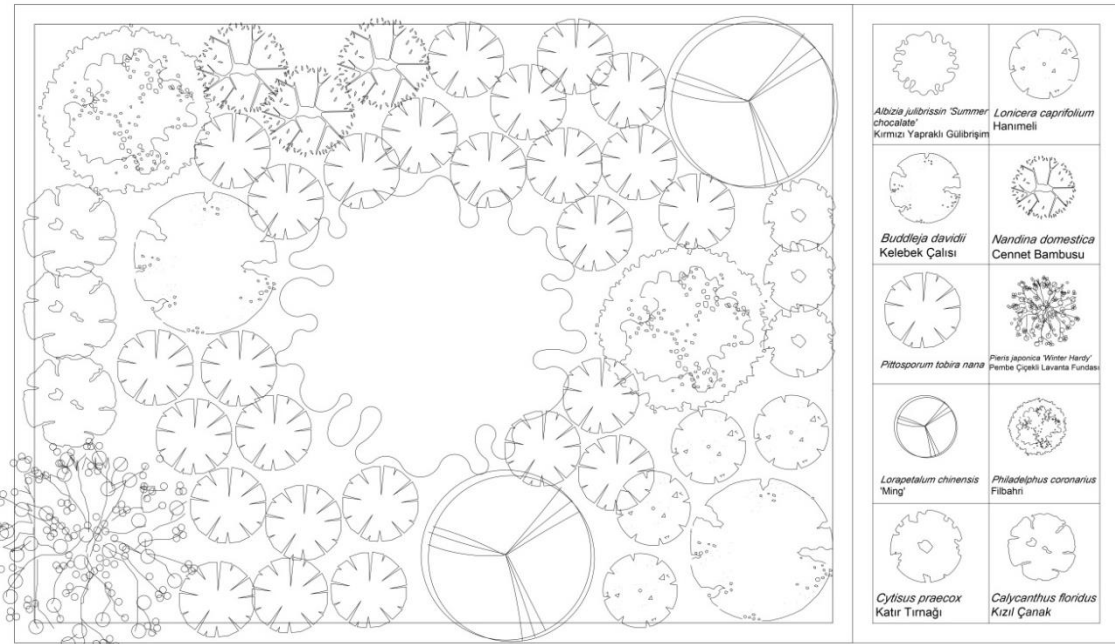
Planting design plan with polychrome color effect (Scale: 1/40)
